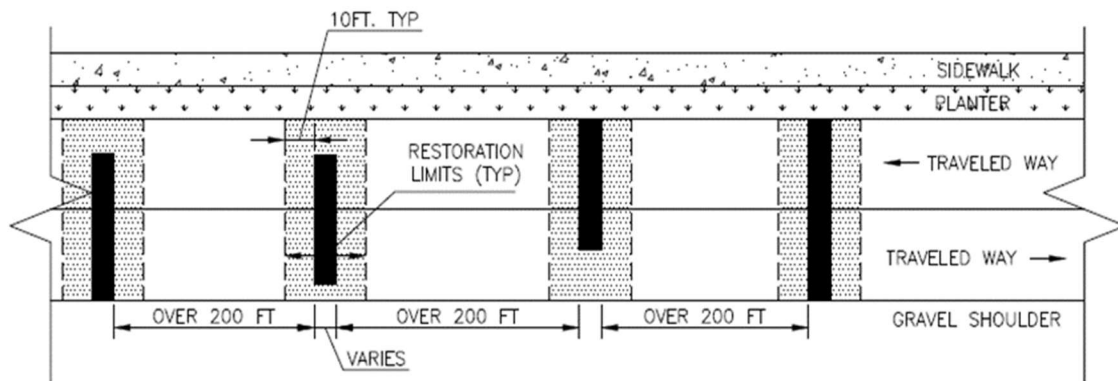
1 Full-Width Overlay Limits for Single Lateral Trenches
